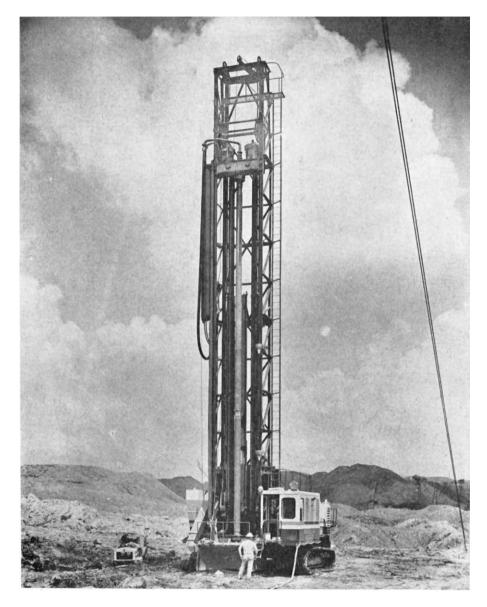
Rotary blasthole drill capable of putting a 15-in. diameter hole down to a depth of 150 ft in 15 min. (Bucyrus Erie Co.)
